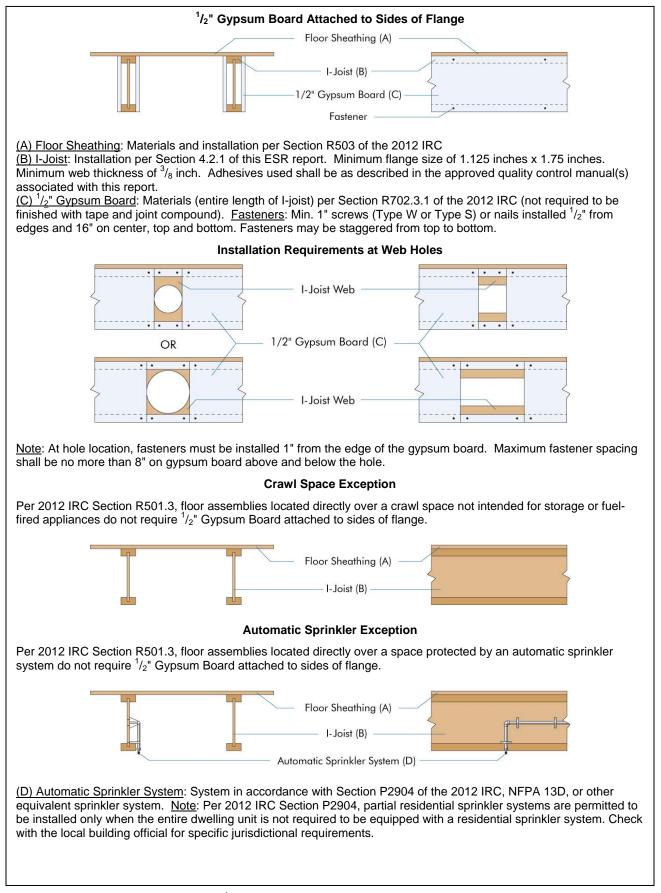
FIRE PROTECTION: 1/2-INCH GYPSUM BOARD ATTACHED DIRECTLY TO SIDES OF FLANGE
